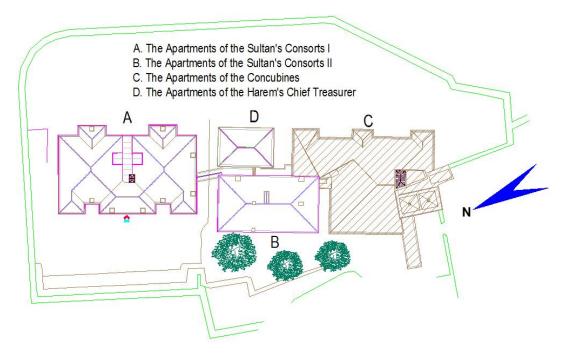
Site plan of the Harem Structures (İnkaya, 2009).
